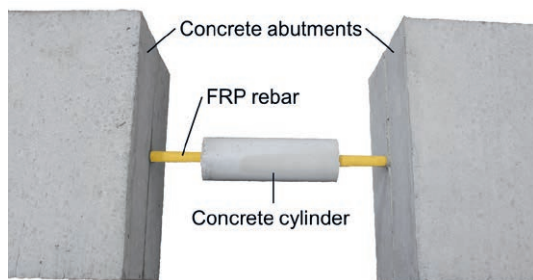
"FRP rebar embedded in concrete abutments with cylinder" | graphic: TU Kaiserslautern
